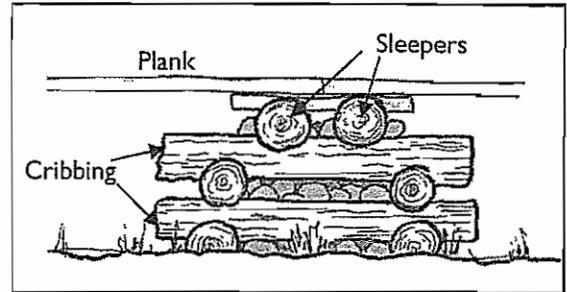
Bog Bridge with Sleepers, or Single Plank Boardwalk
